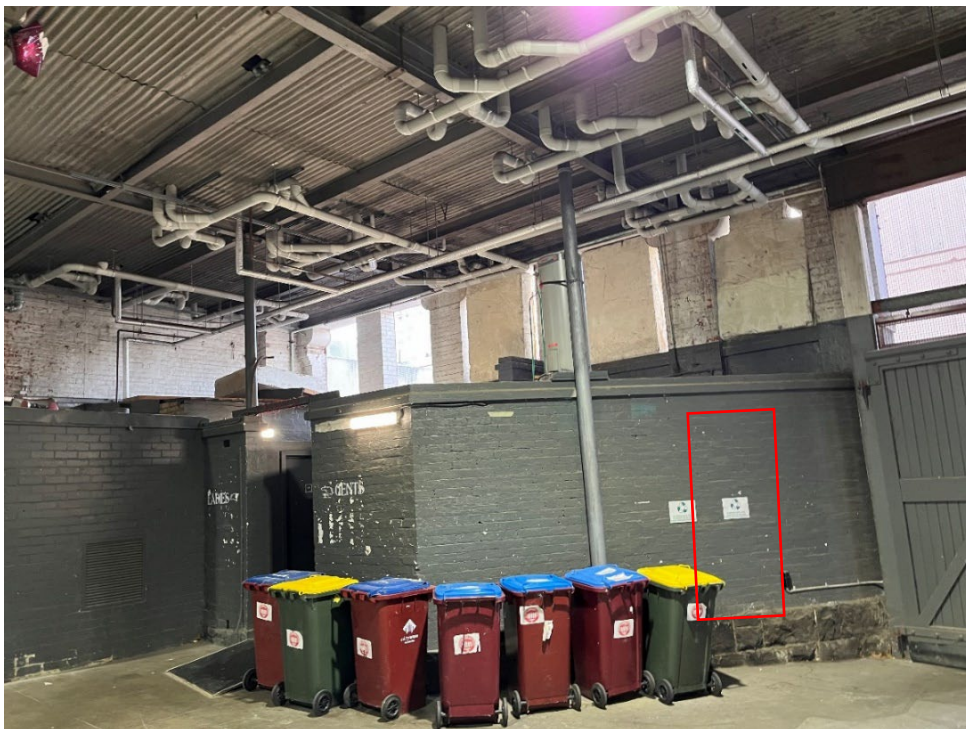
Toilet and store in undercroft area showing approximate portion of south angled wall proposed for demolition
